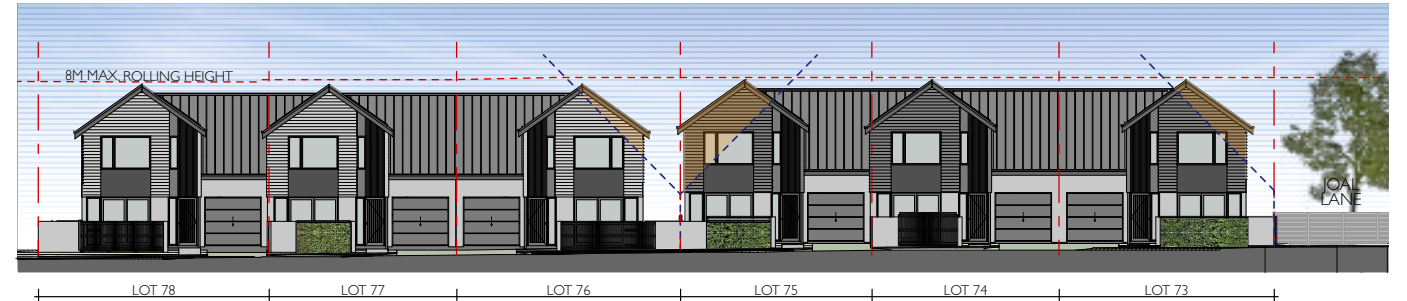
Elevation of dual frontage units 73-78 along Road B (primary frontage)
